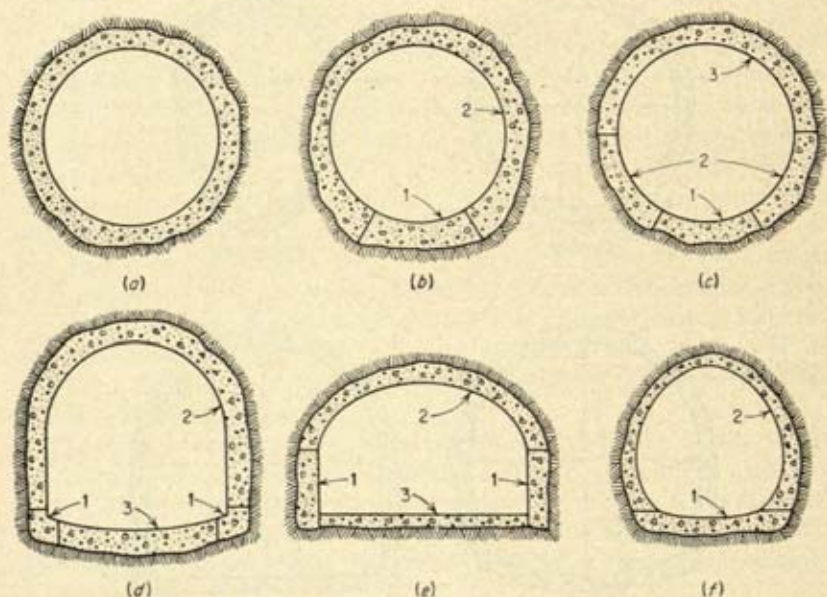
Sequence of placing concrete lining in tunnels.
